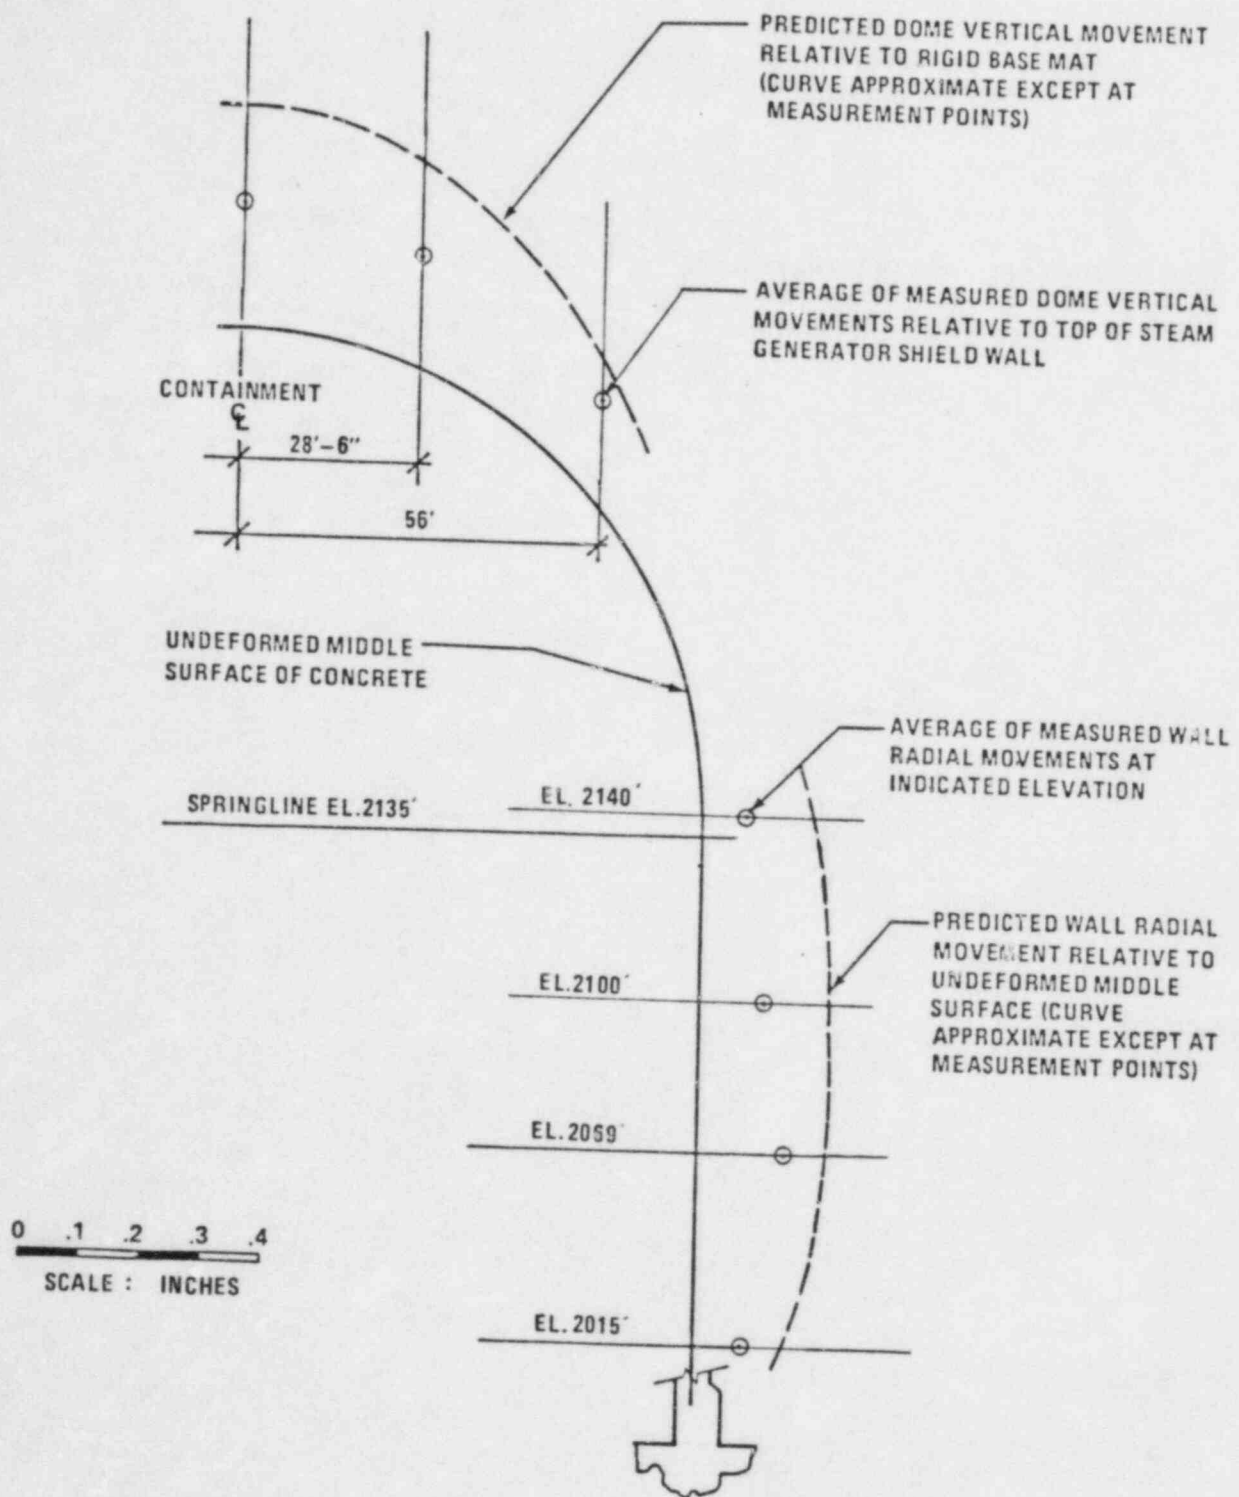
CONTAINMENT DEFORMATIONS AT 69 PSIG - WALL & DOME
